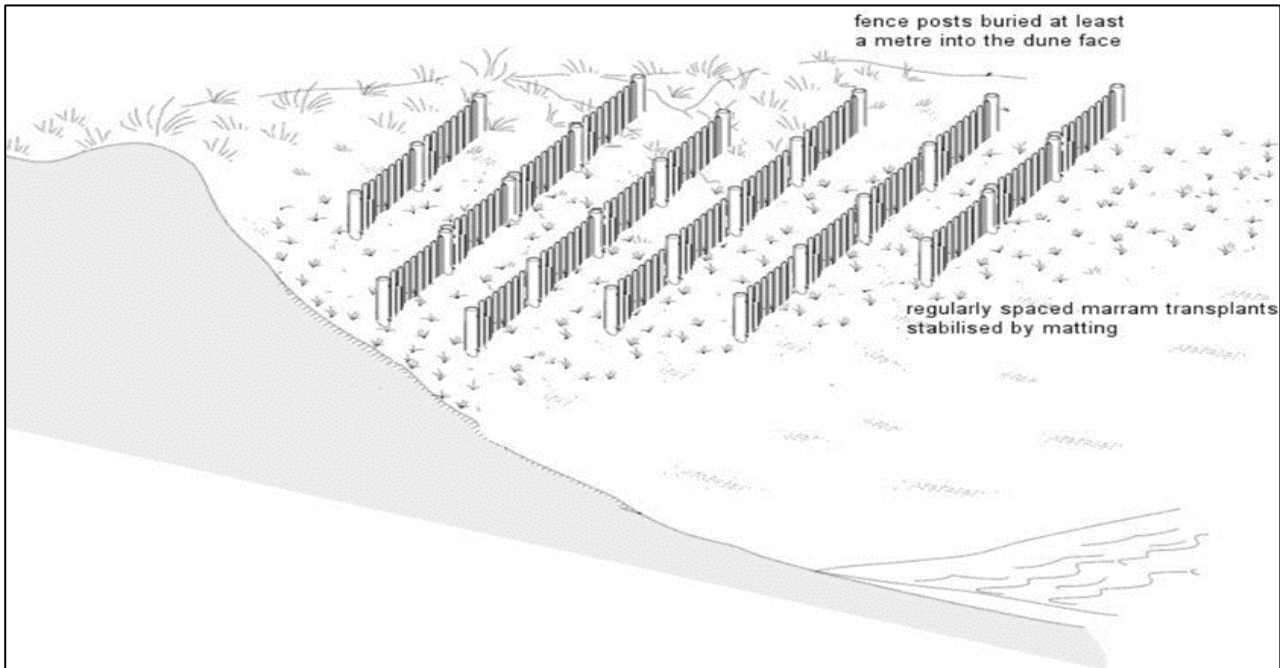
Typical section of a re-profiled dune face stabilised with sand trap fencing and the planting of marram grass
